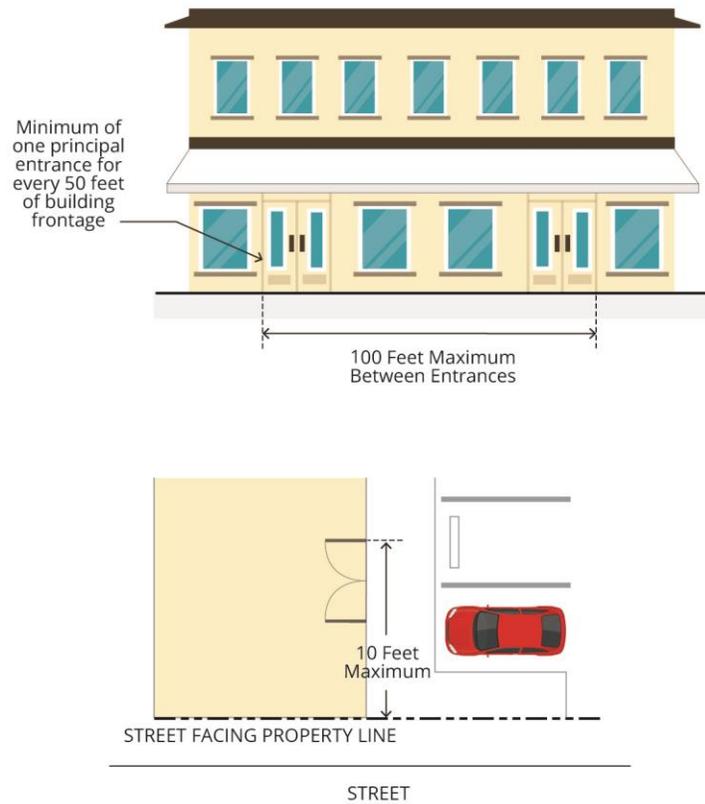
A GROUND FLOOR NONRESIDENTIAL USES, ENTRANCE DESIGN
